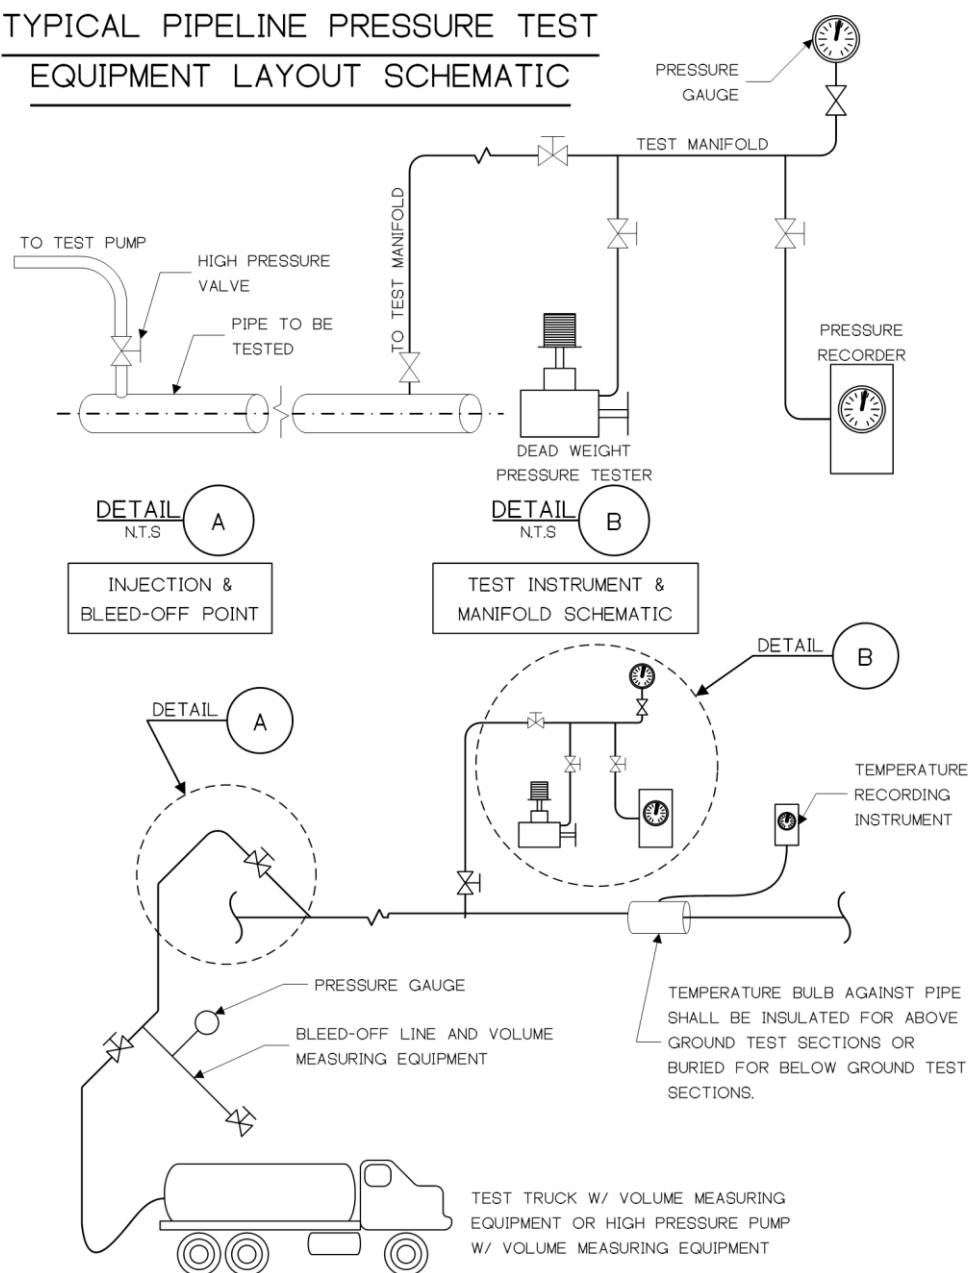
Pipeline Pressure Test Equipment Layout Schematic
